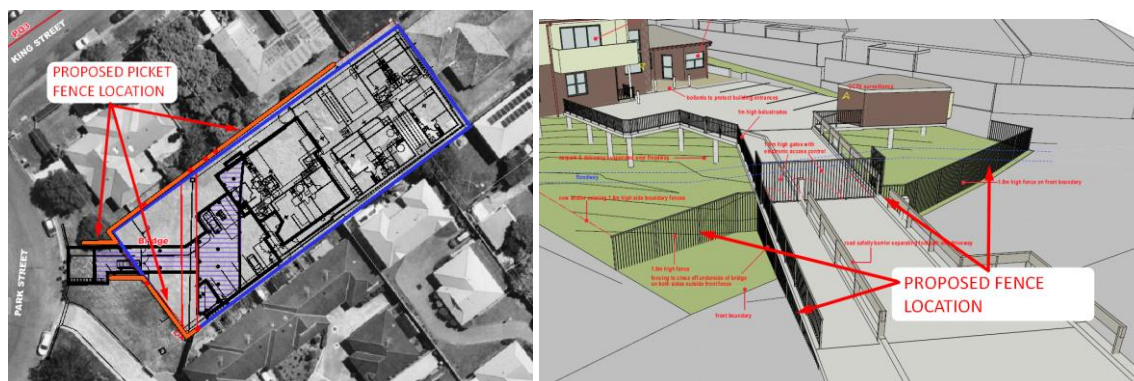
Proposed picket fence incorporated into model (left) and proposed in architectural plan (right)
